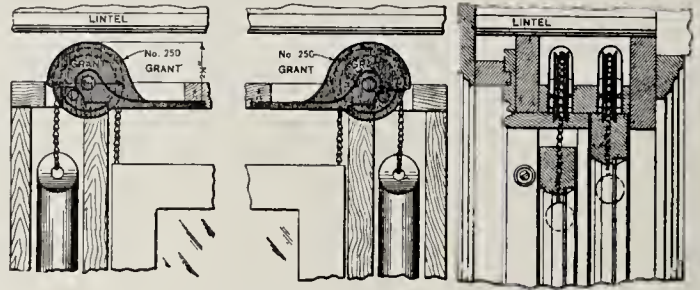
SINGLE FRAME AND SECTION OF PULLEY.
